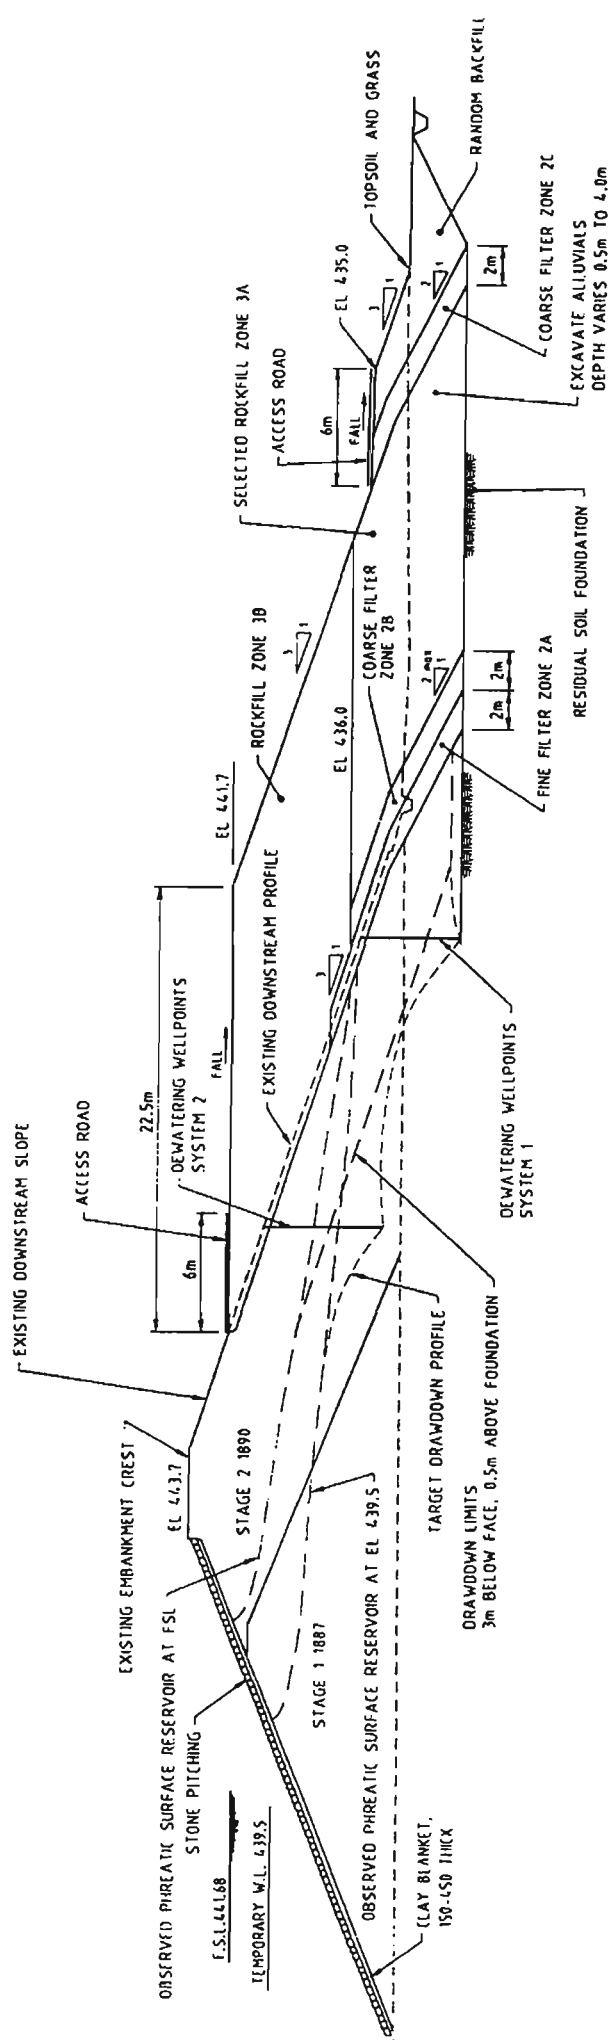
Wartook Embankment - typical cross section after remedial works
